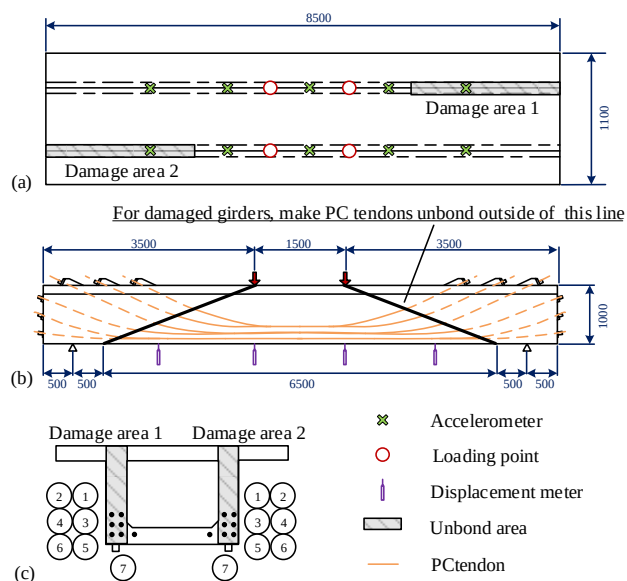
Experimental girder: (a) Plan view, (b) Elevation view, (c) Cross-sectional view
